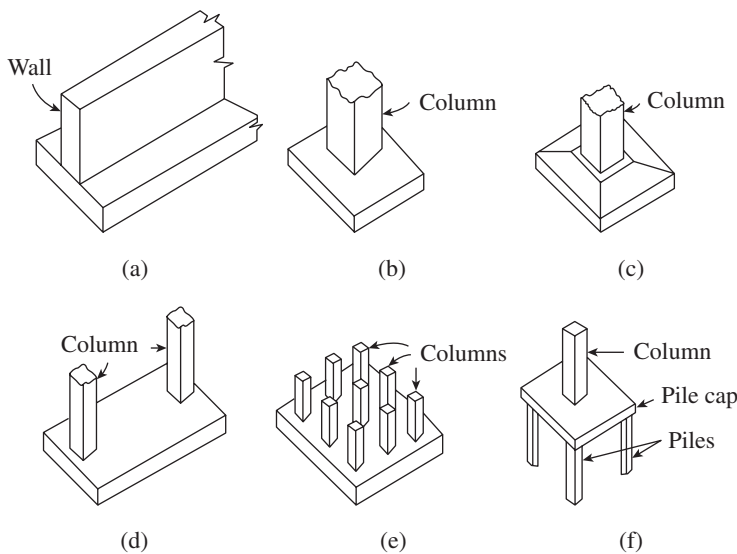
Types of footings (a) Wall footing (b) Isolated spread footing (c) Sloped footing (d) Combined footing (e) Raft foundation (f) Pile foundation
